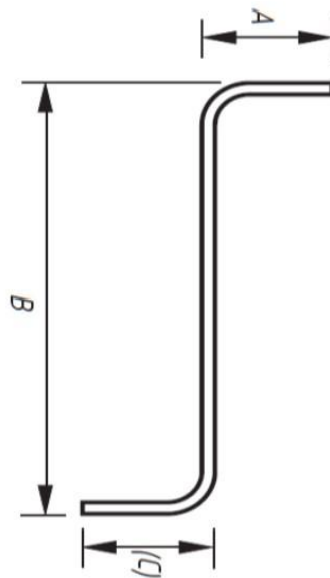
Shape of the vertical steel bars used in the test (Shape code 23 of 8666:2005)
